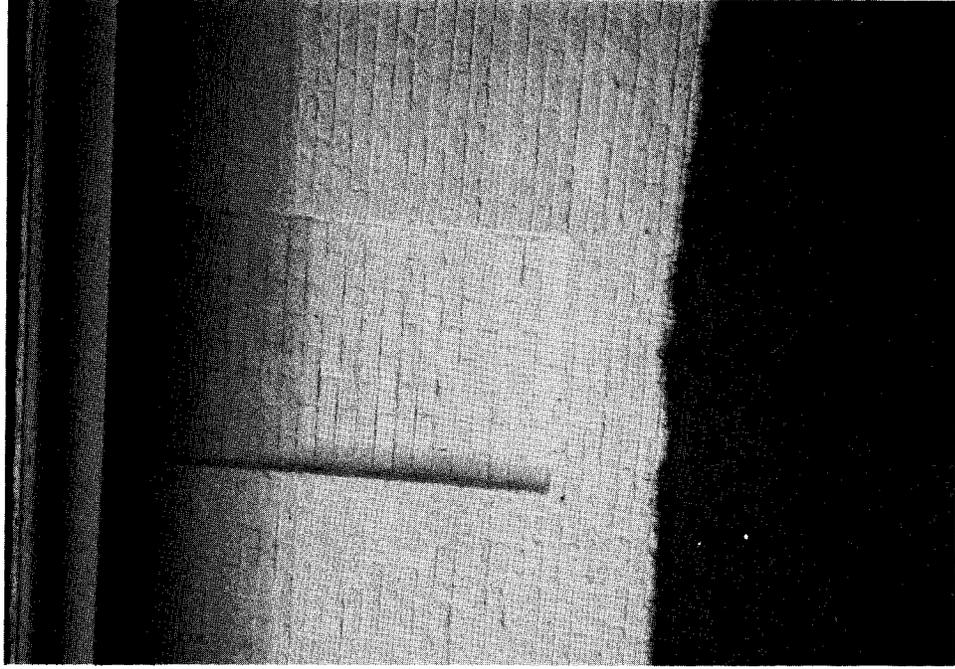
Tower Connector, blocked window on east elevation. Note larger brick size.
